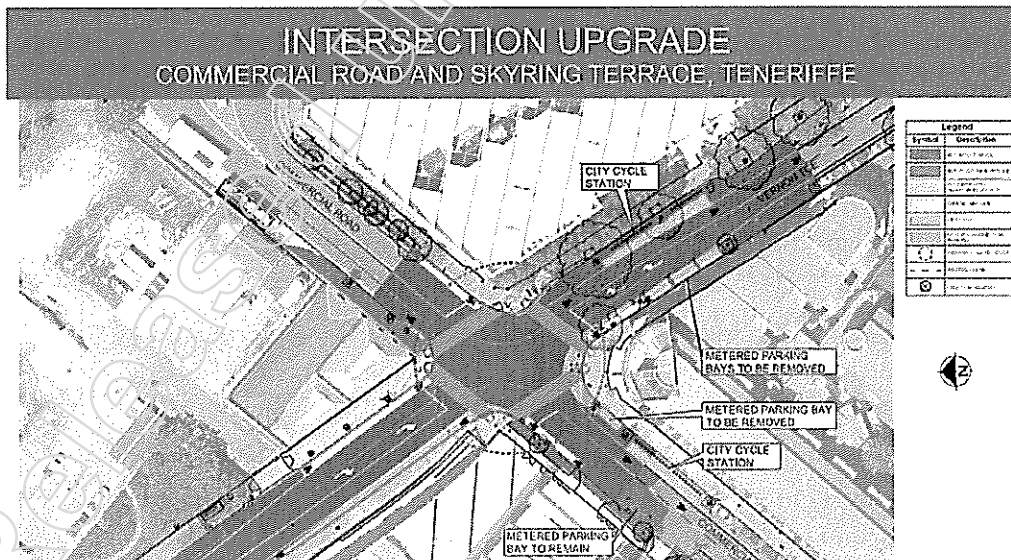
Vernon Terrace / Commercial Road signalled intersection layout
